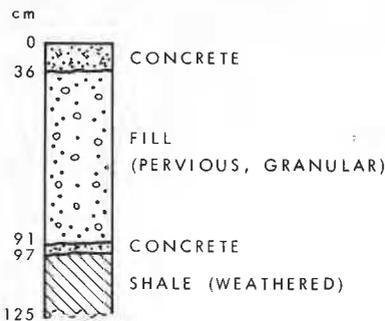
Vertical profile of pit No. 2 showing weathered shale beneath concrete protection slab.
